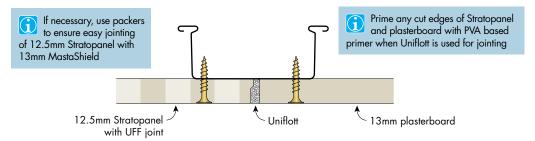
Stratopanel to ceiling border Using Wide-face Furring Channel Section
